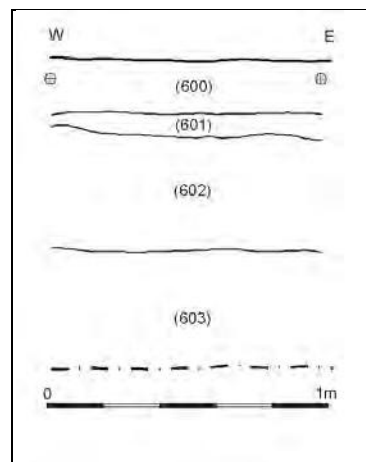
Representative section of Trench 06, showing construction layers of modern road.
